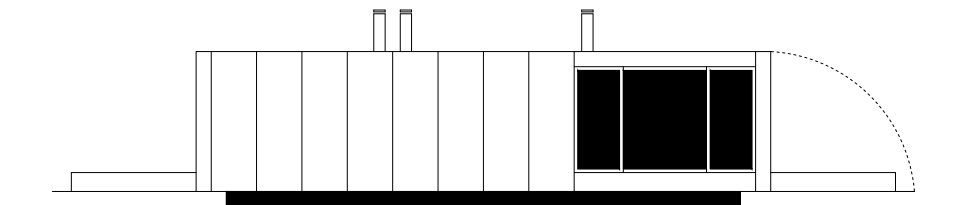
Facade, Studio Furillen. Note. Created by the author based on the original drawing.
